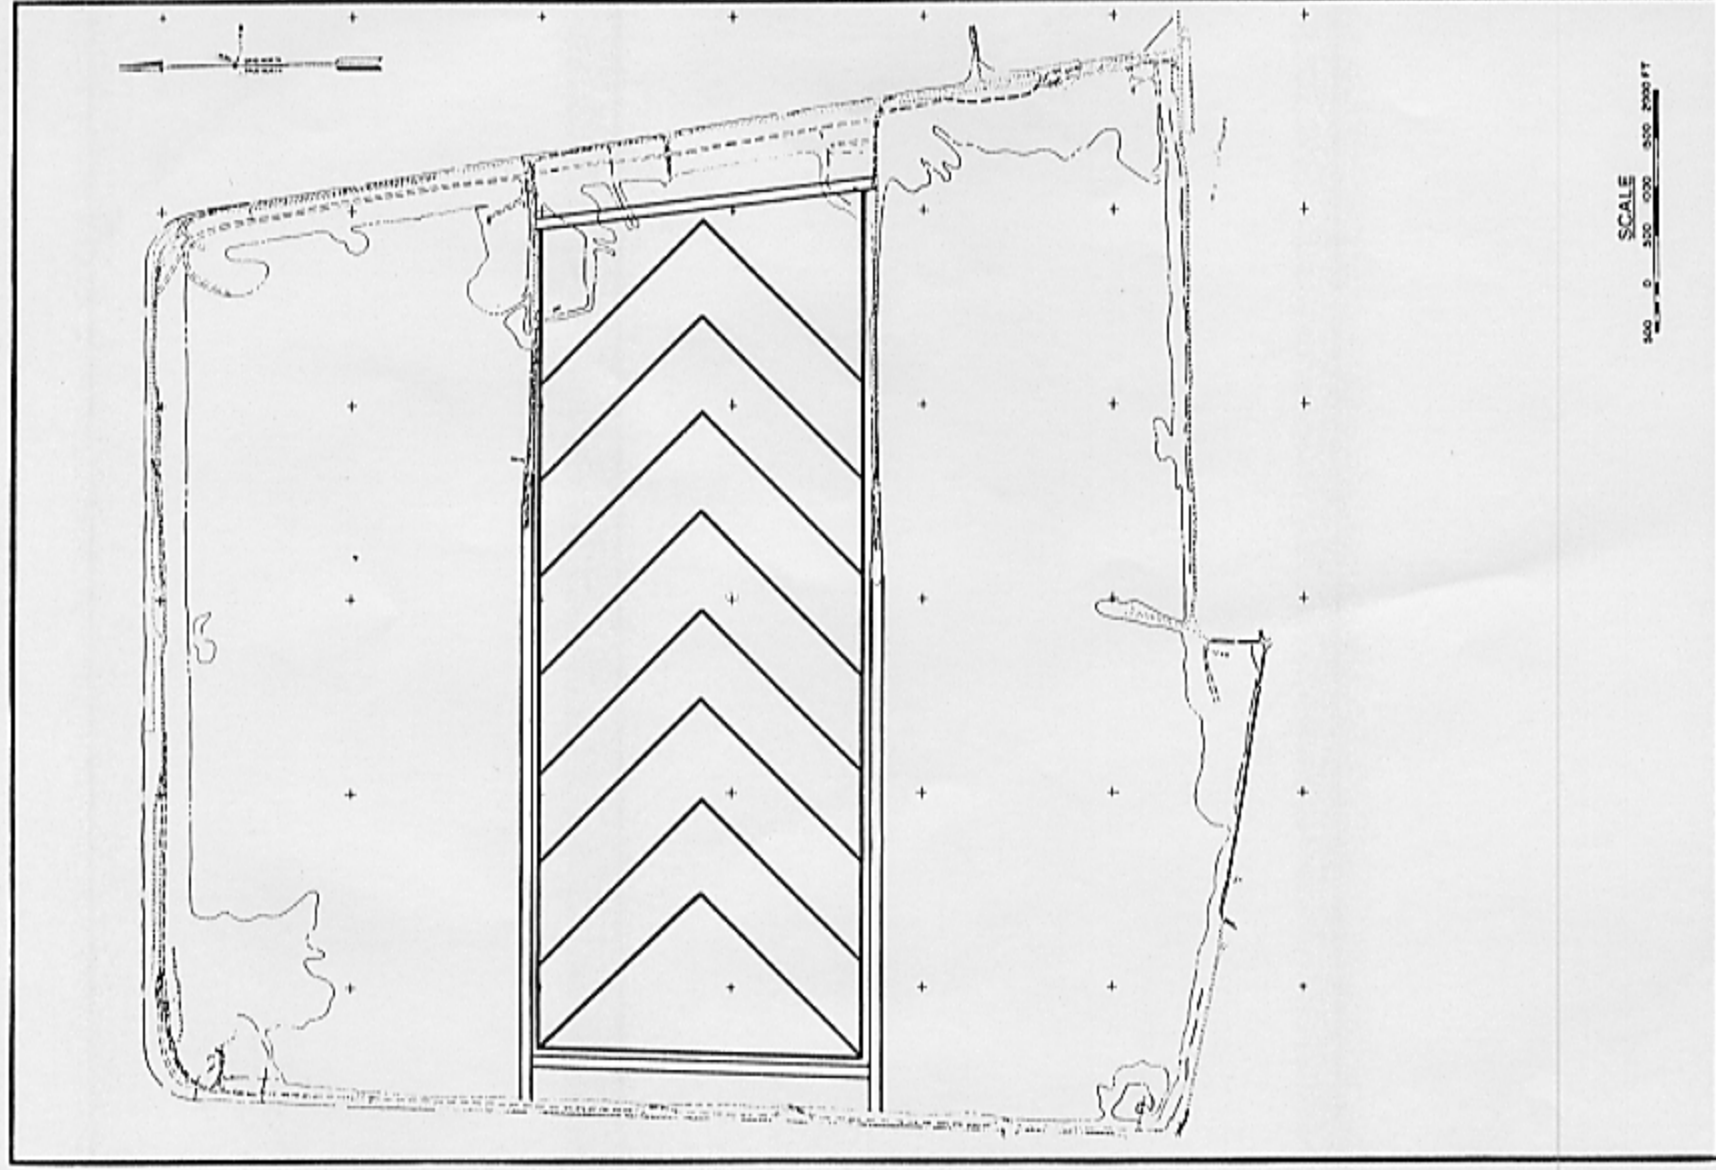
Interior trench layout for dredged material dewatering (from CIMP)
